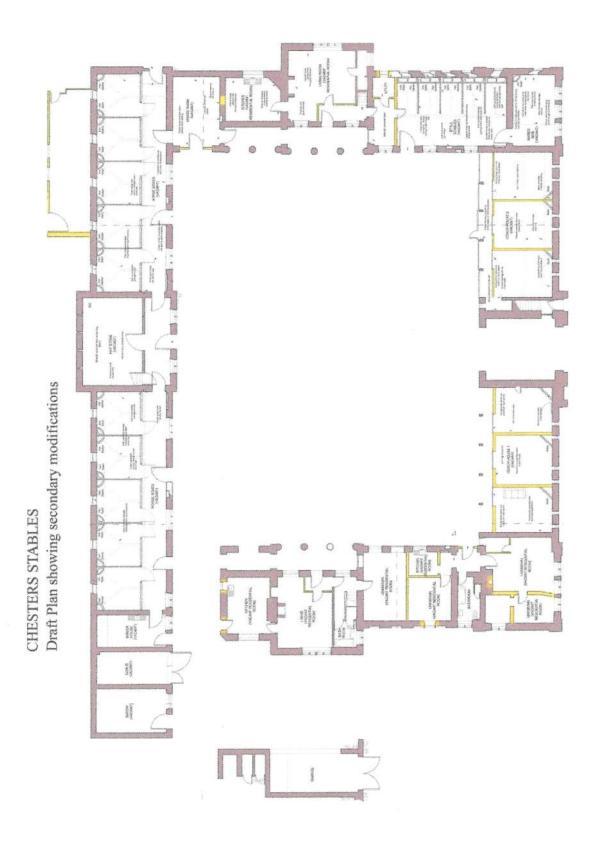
Chesters Stables: Amended by Peter Ryder from Doonan base plan.
